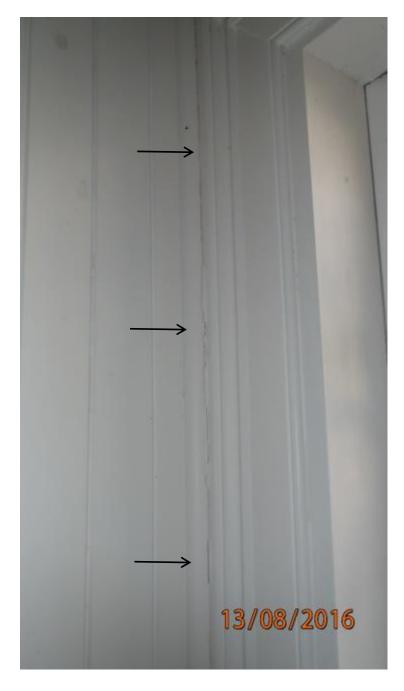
shows staining to the cement rendered wall surface in Bedroom 2.
